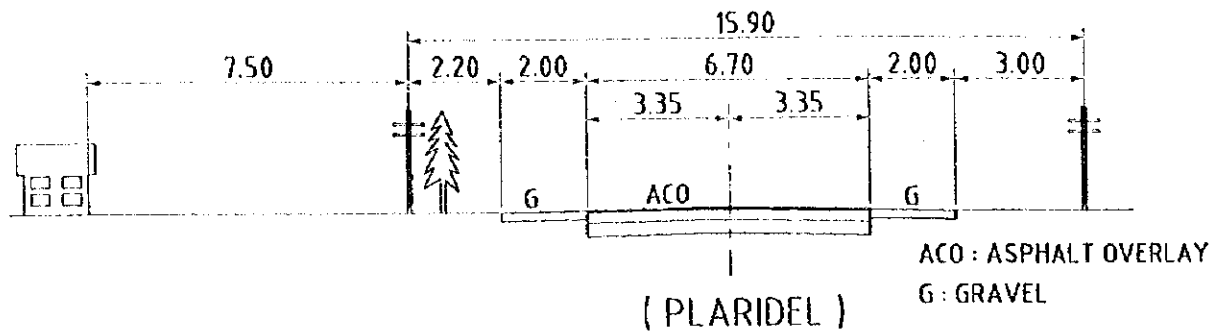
TYPICAL CROSS-SECTION OF URBAN SECTIONS
